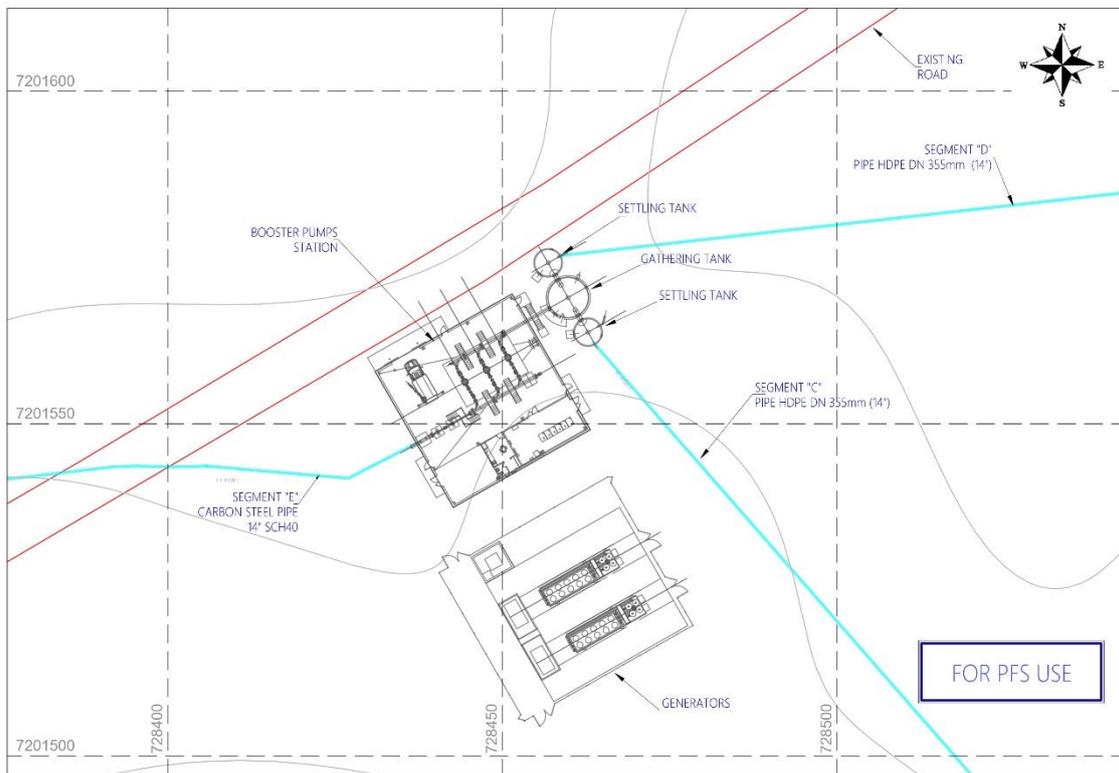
General Arrangement Piezometer/Wells Pump Booster Station Plan
